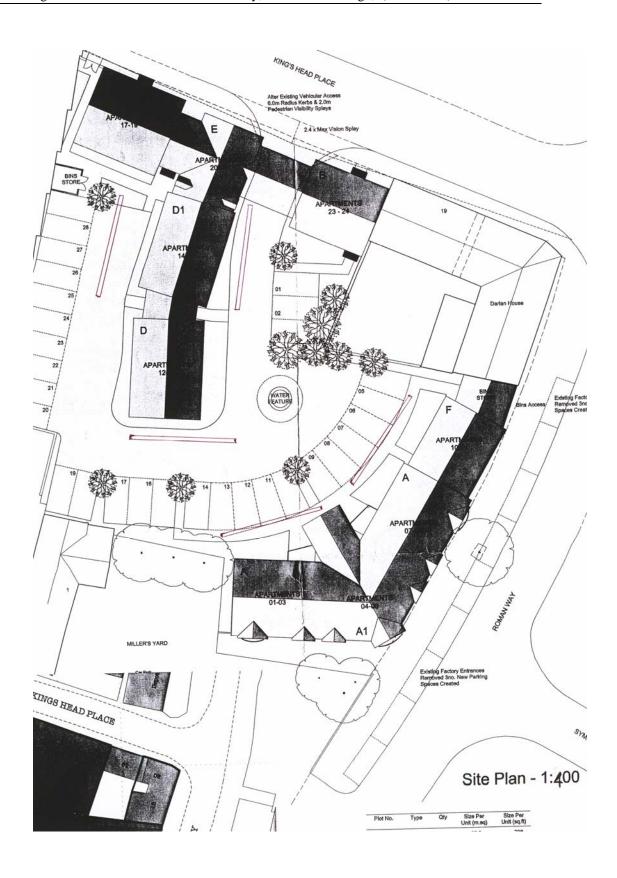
Proposed location of trenches in relation to development plan. Original Scale 1:400.
